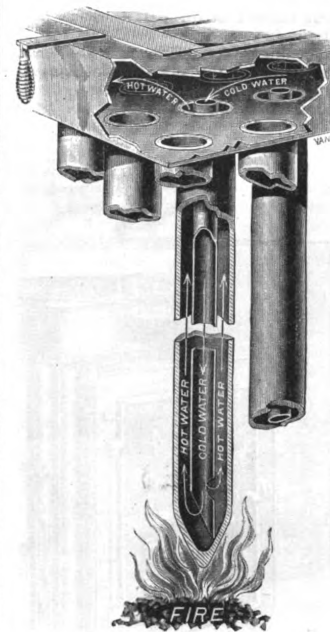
The Bolton Hot Water Heater.—Enlarged View of Drop-Tube, Showing Circulating-Pipe.
